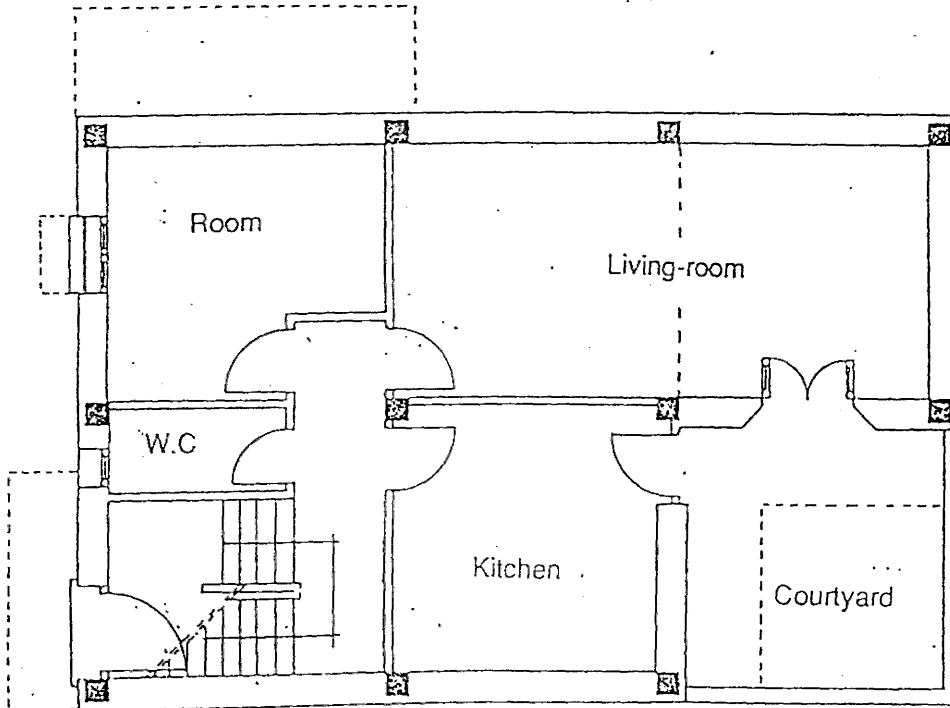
a: 5 Bedrooms type, ground-floor.
